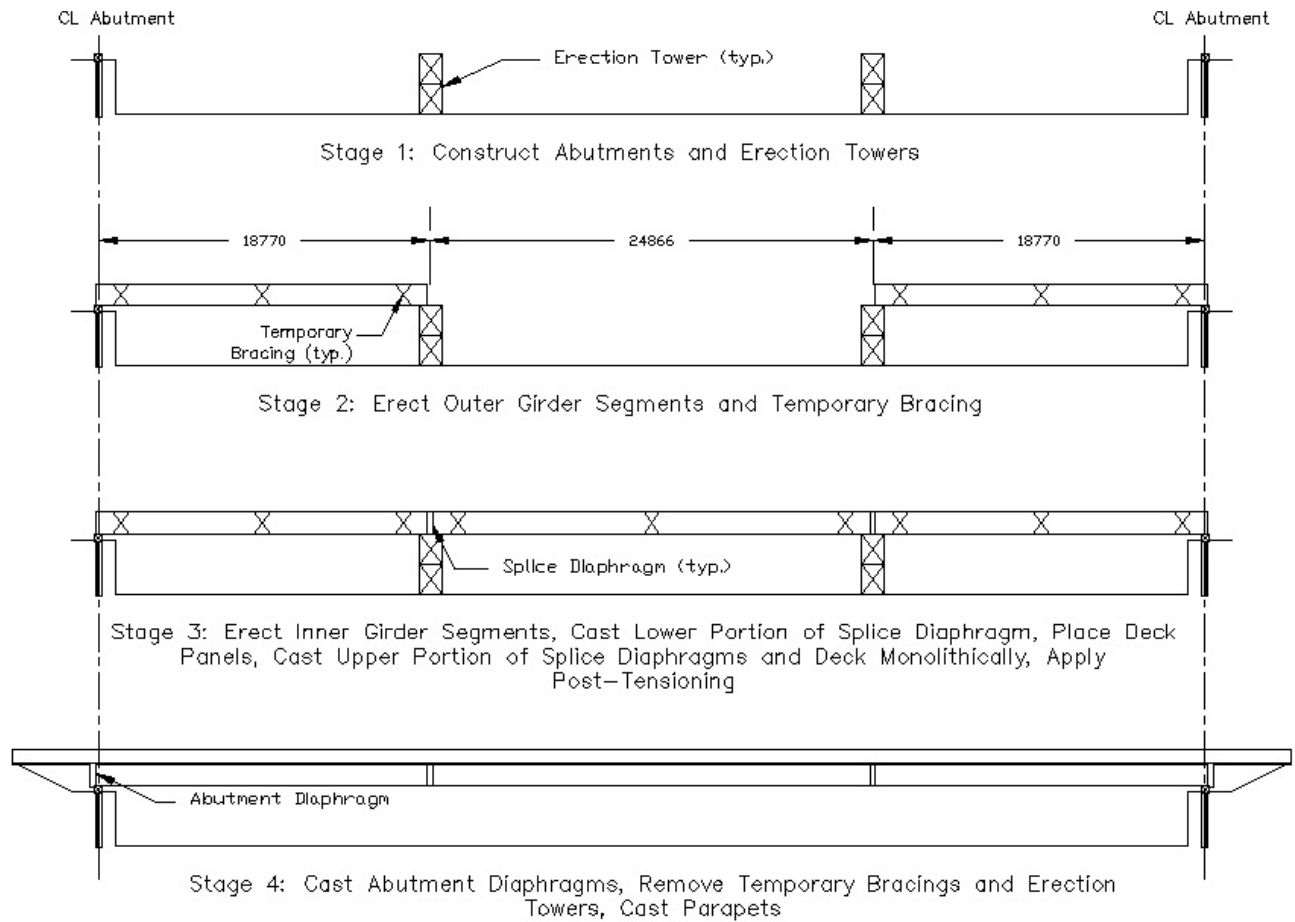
Spliced girder bridge erection sequence (1 in. = 25.4 mm).
